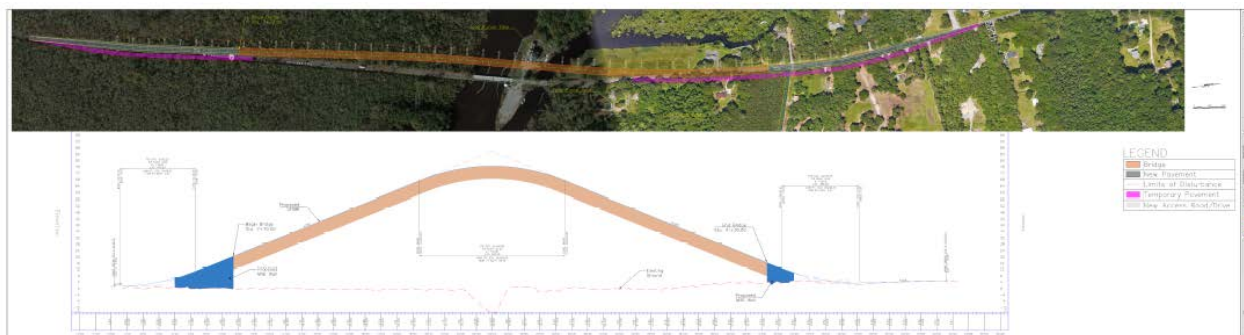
Conceptual Plan for the West Alignment Fixed Bridge.
